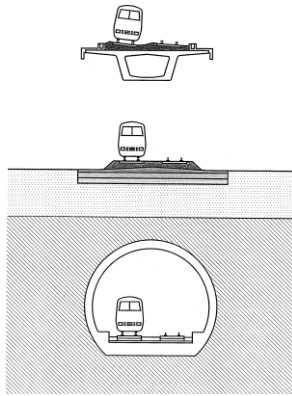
Measurements of railway vibration on a bridge, a surface and a tunnel line
